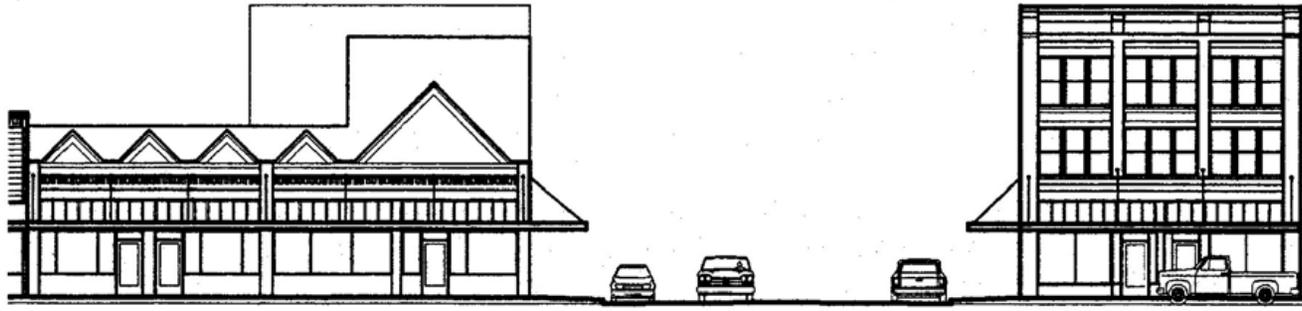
The massing of the corner portion of the building is increased in height so as to allow it to "hold the corner" and to provide a better complement to the taller building across the street.
